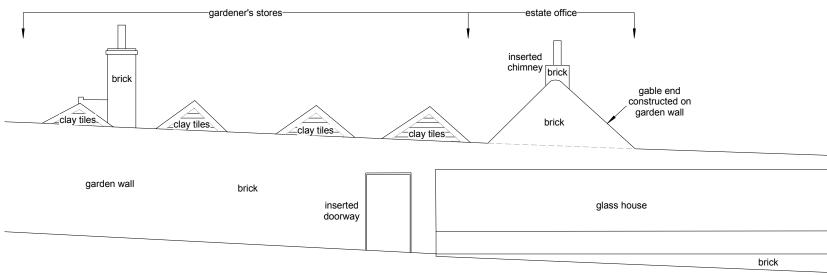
Structures 3 & 3a, 18th-century estate office and gardener's stores south-west elevation.
